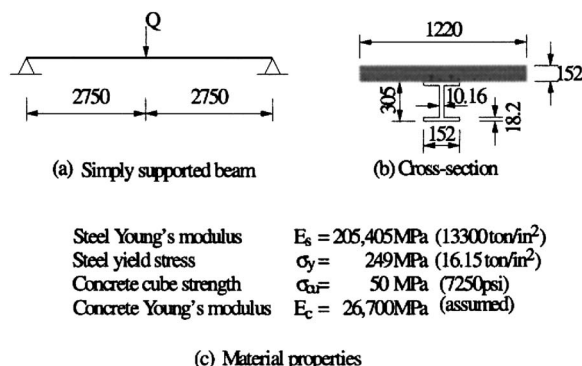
Simply supported composite steel-concrete beam tested by Chapman and Balakrishnan (1964)
